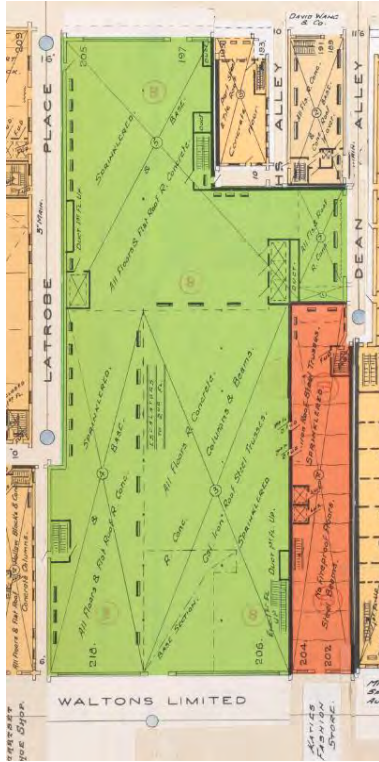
Detail from a 1948 (amended during the 1960s) Mahlstedt plan shows the shop at 202-204 Bourke Street (shaded in red) in the late 1960s. Note the openings on the western elevation of the subject property, which allowed accessed to 206-218 Bourke Street (shaded in green). (Source: Mahlstedt Map Section 1, no 7, 1948)
